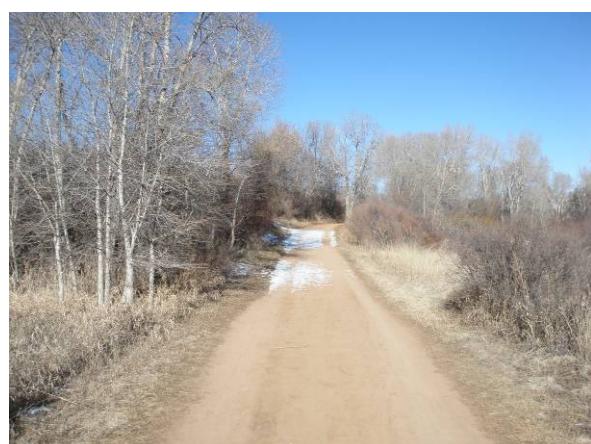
View of the continuation of the preferred trenching route along the New Santa Fe Trail foot path.
